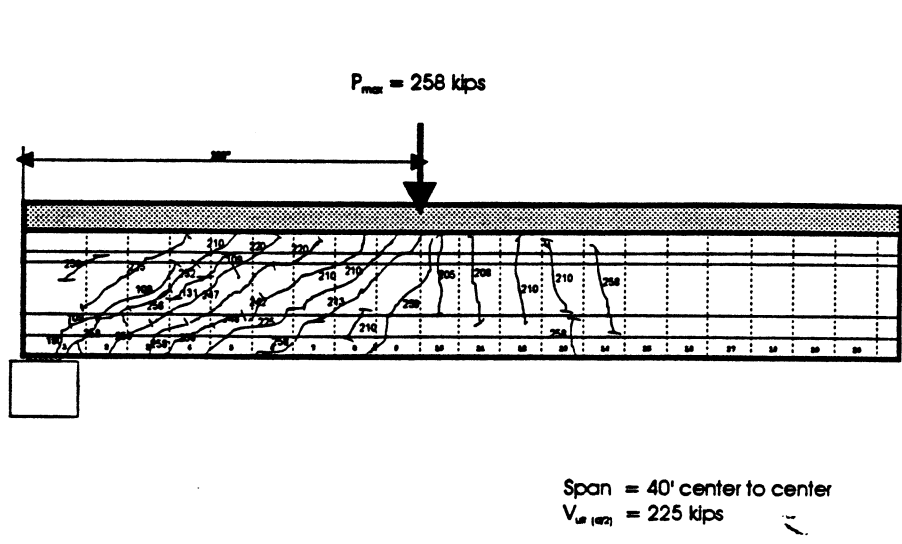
Cracking Pattern for Girder F12N
